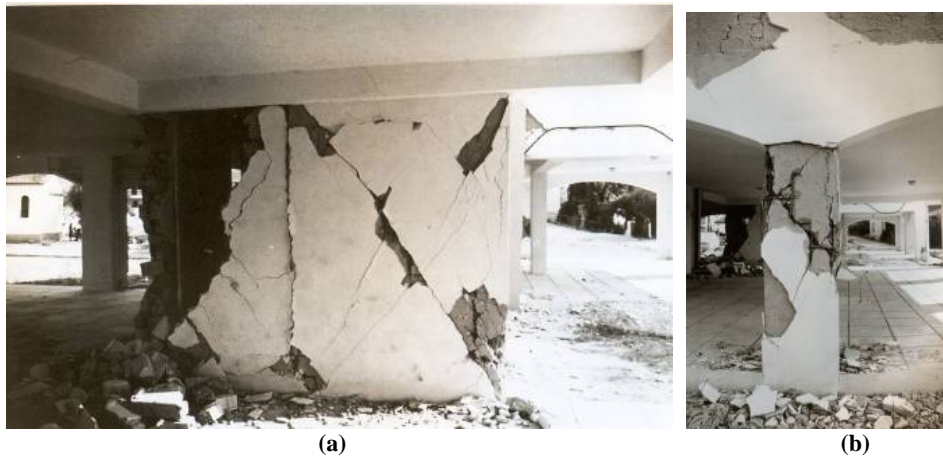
(a) Damaged column T1, “soft story” workers housing building; (b) Damaged column K2.
